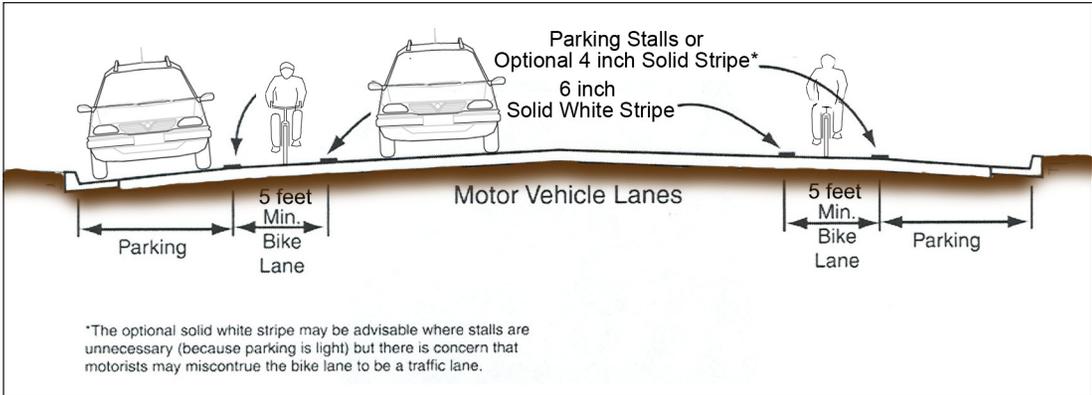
illustrates bike lanes along streets where parking is permitted. As indicated, the minimum width bike lane shall be 5 feet for cases in which a parking lane exists.
